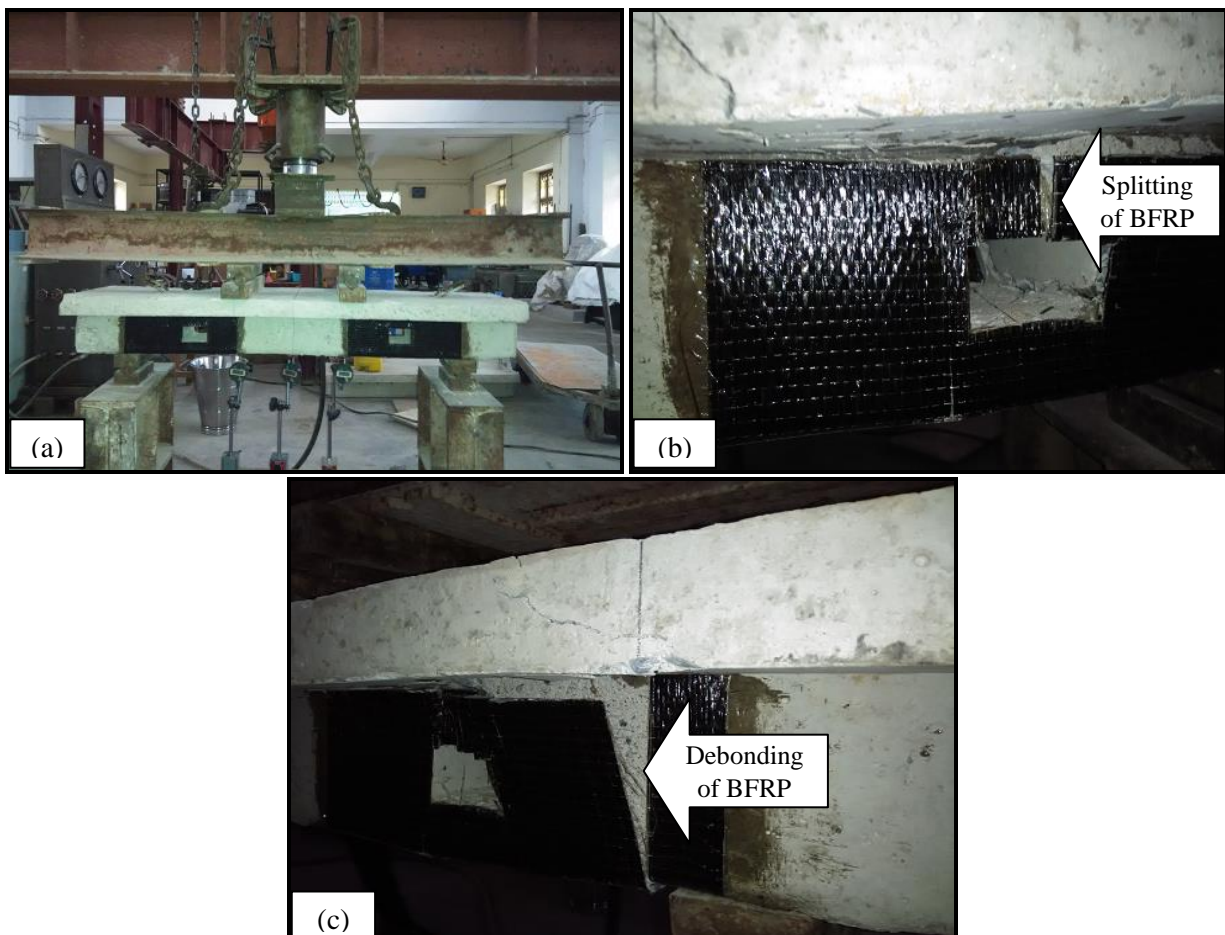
(a) Experimental Setup of beam SB15 under four-point loading system, (b) Initiation of splitting of BFRP sheet, (c) Ultimate failure of beam SB15 by debonding of BFRP sheet followed by diagonal shear crack
